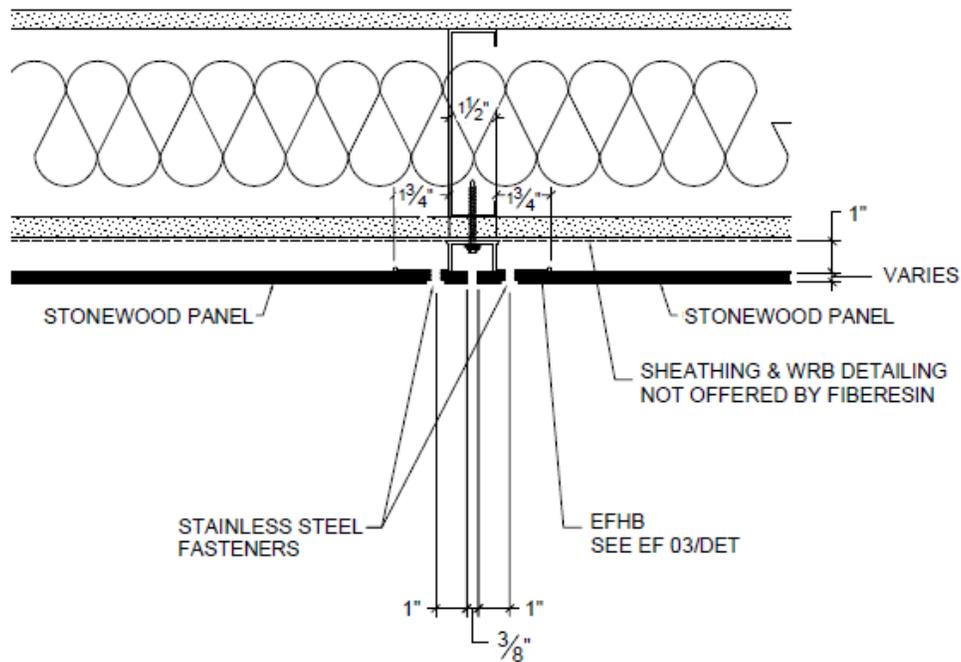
STONEWOOD EXTERIOR ARCHITECTURAL PANELS EXPOSED FASTENER SYSTEM DETAILS VERTICAL PANEL JOINT WITH HAT-CHANNEL (EFHB)
